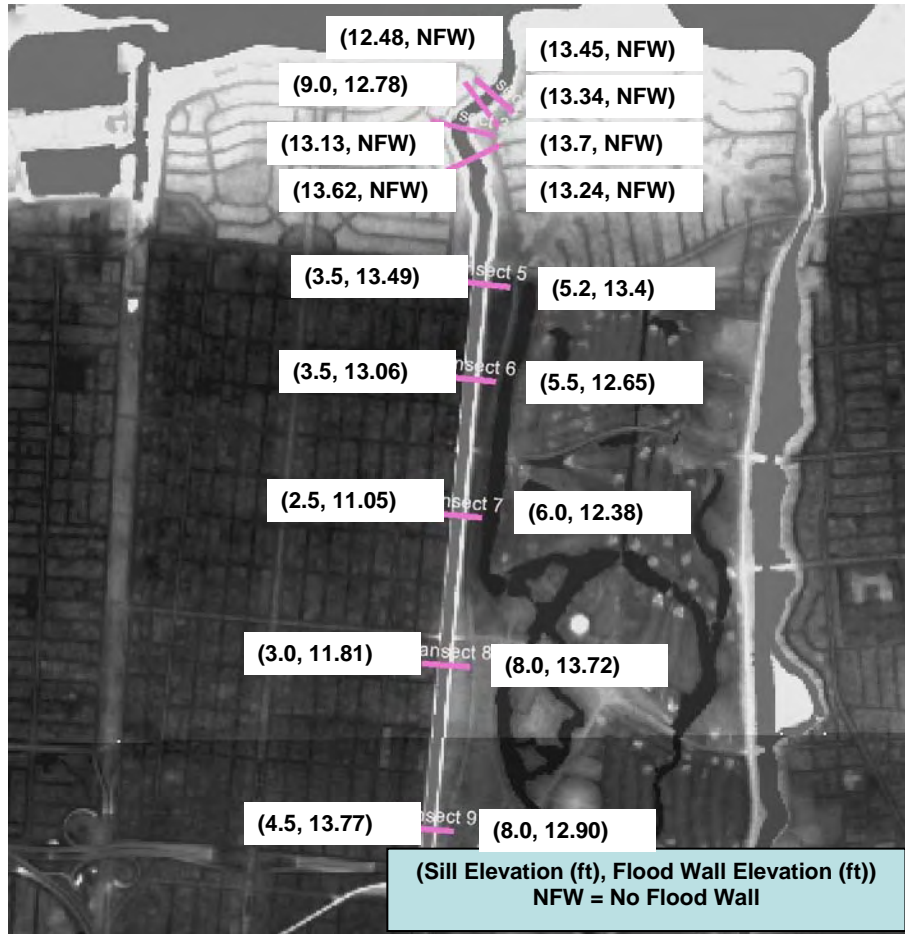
Aerial photograph of Orleans Avenue Canal showing sill and floodwall elevations
